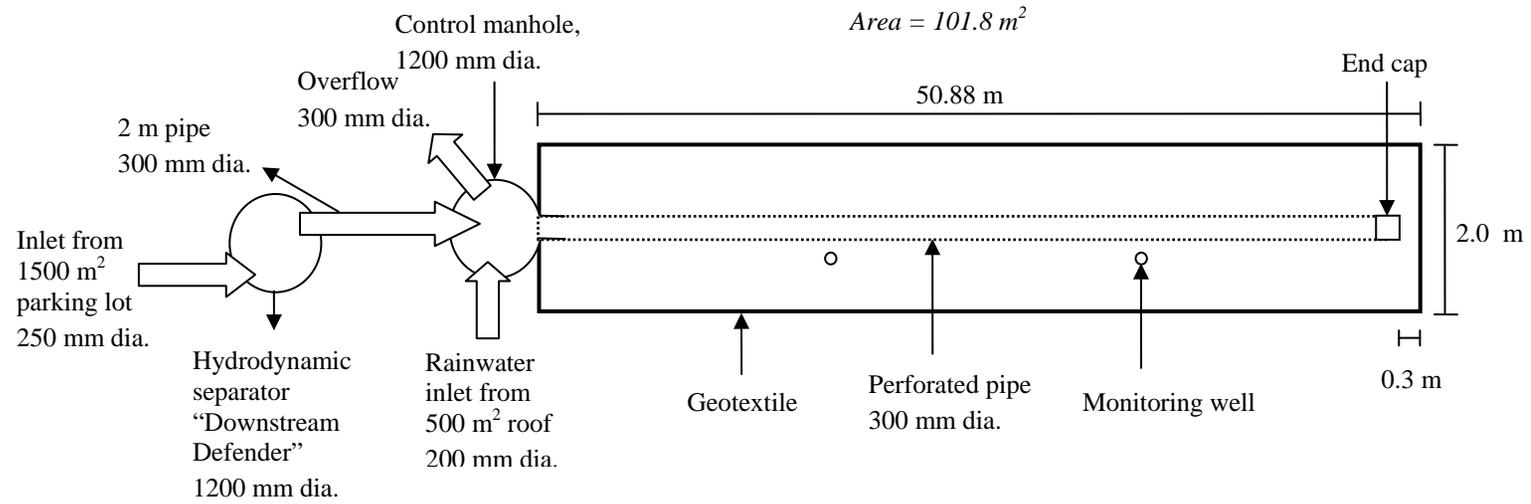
Plan view of the infiltration trench receiving road (1500 m²) and roof runoff (500 m²)
